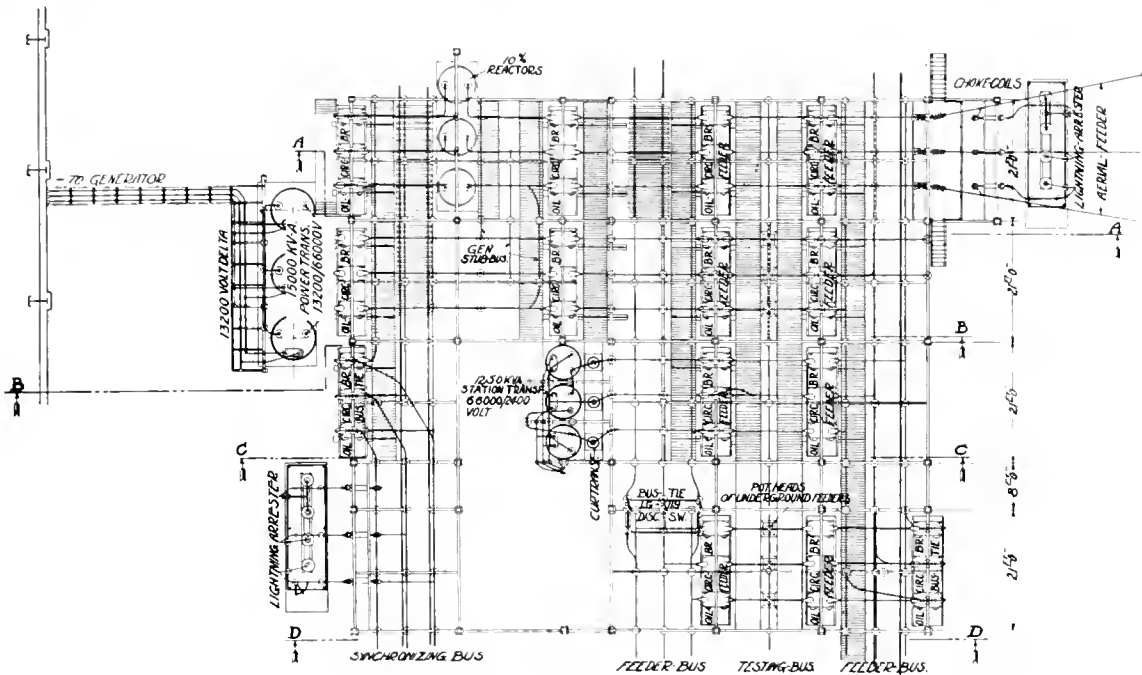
Plan of Unit Section of 66,000-volt Outdoor Switch Gear
